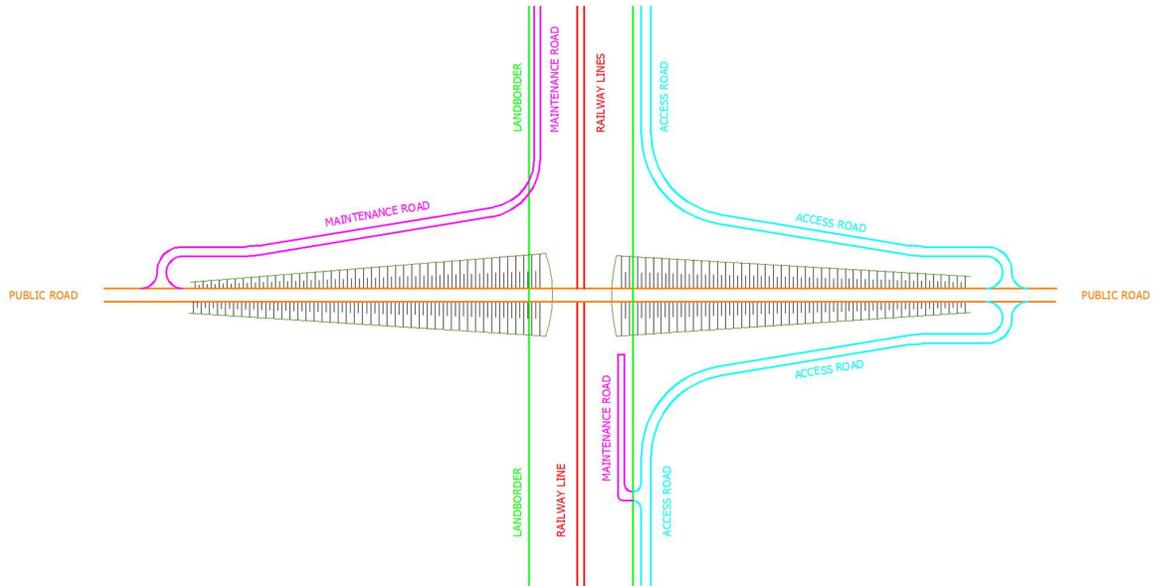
RECOMMENDED PRINCIPAL SCHEME OF ROAD CATEGORY DIVISION
